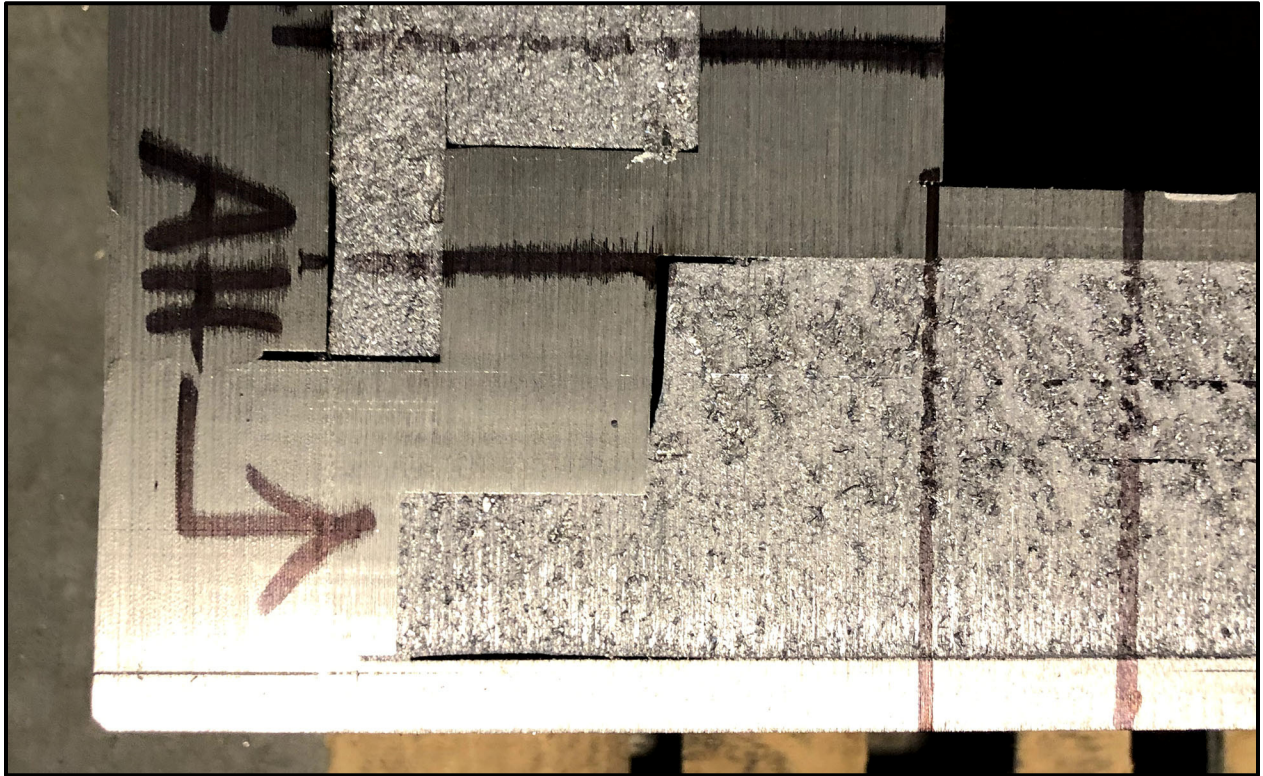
SC-30G3 18TU-04 Destructive Disassembly Cut AH at Lower Flange
